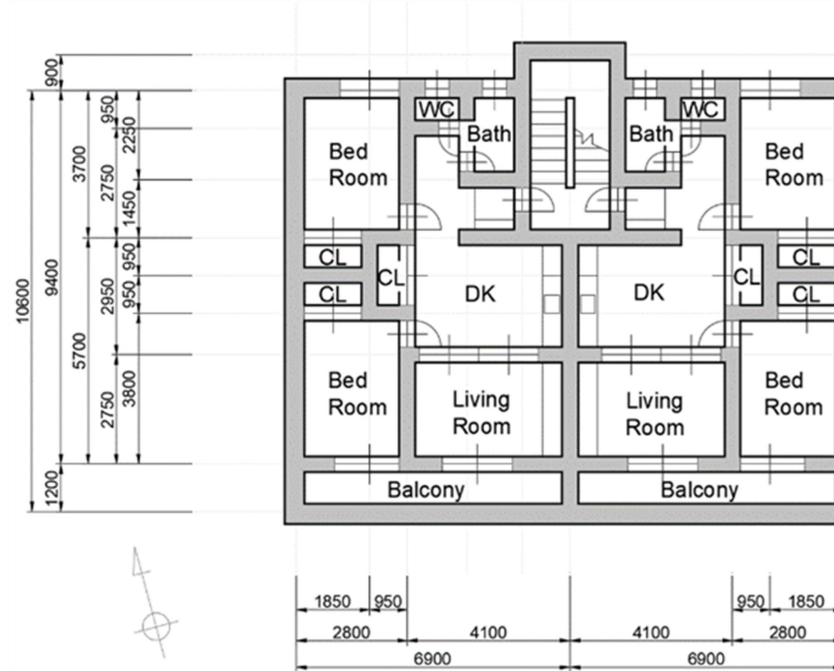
Detailed drawing of the building to be analyzed (four units exist, inverted).
